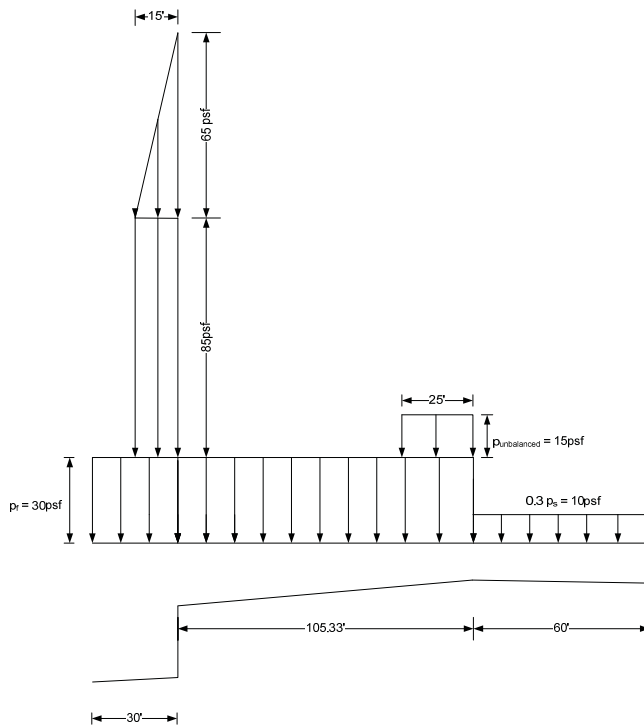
Case 3: Unbalanced Snow Load for West Direction Sloping Roof with Drift Load and Sliding Load on Lower Roof
